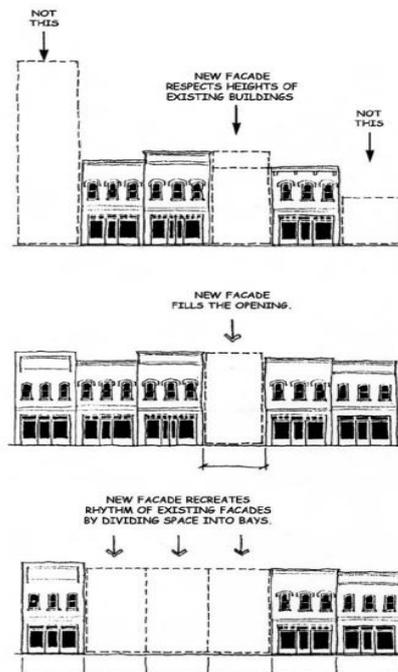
Diagram demonstrating how infill construction might try to match and retain the building massing of existing structures
